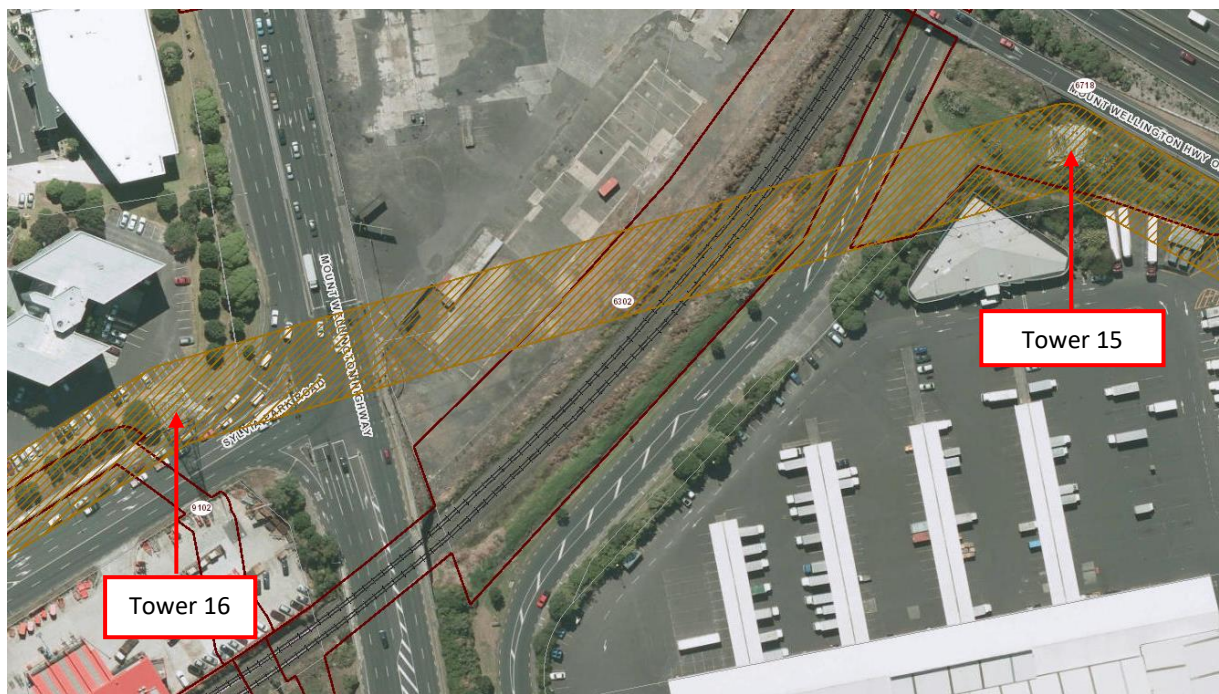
Tip Top Corner Tower 15 and Tower 16 Works Site:
